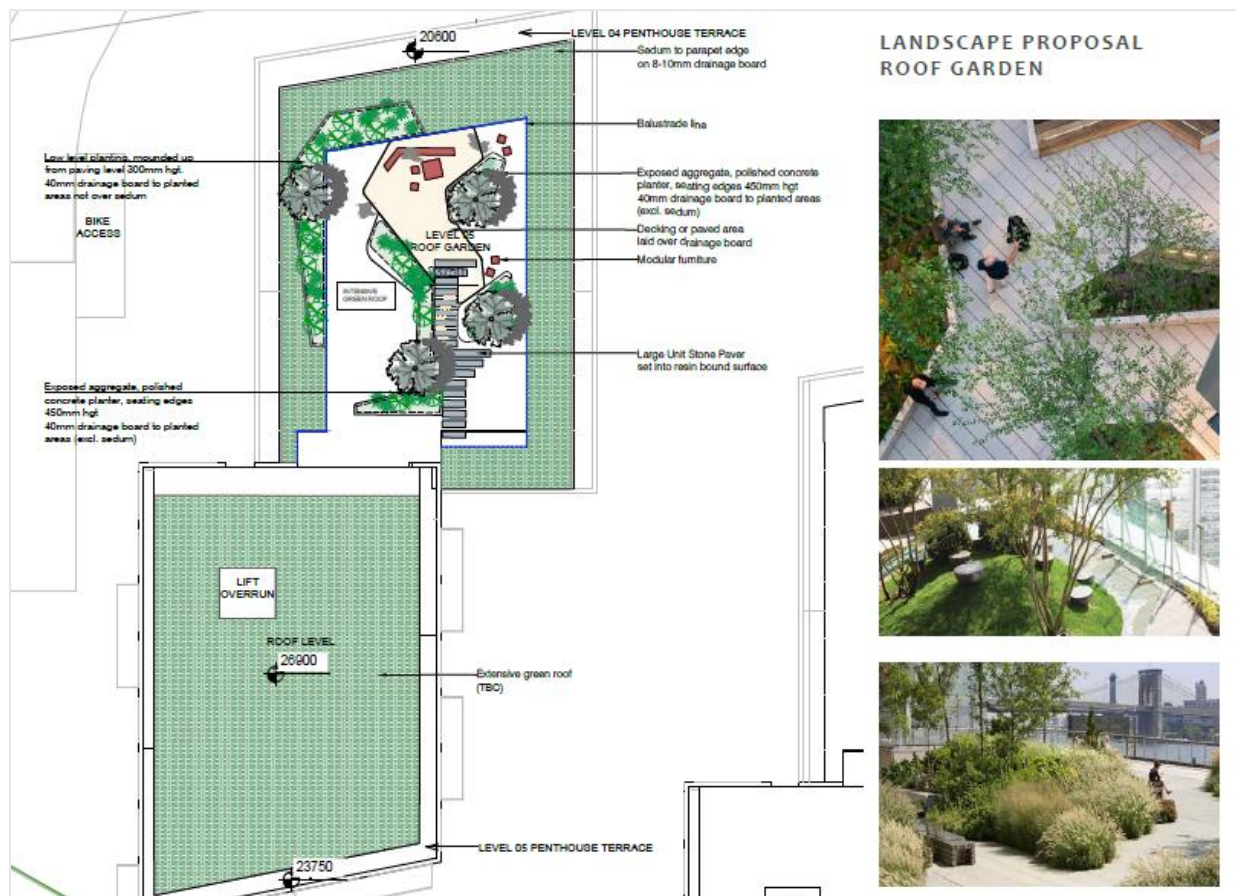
Roof Garden (Extract from Landscape Design Statement)
